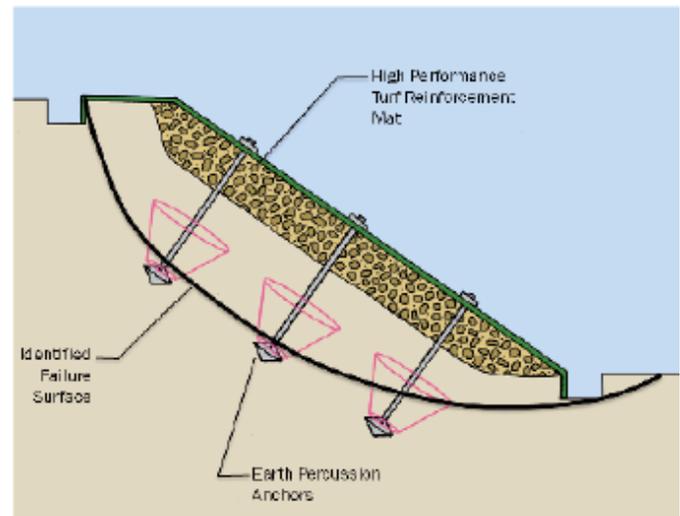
ARVS Cross-section Anchoring Past Failure Plane
